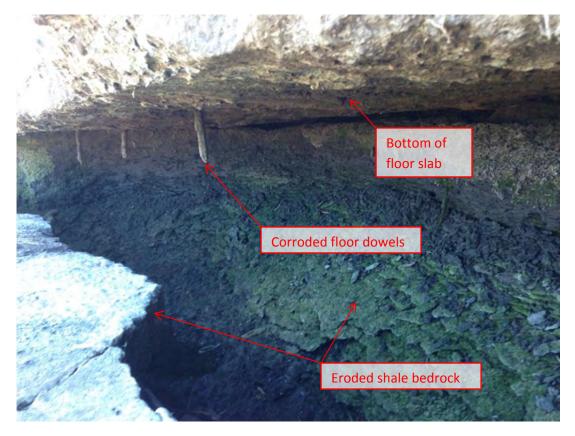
Erosion and undermining of shale bedrock (note floor dowels).
